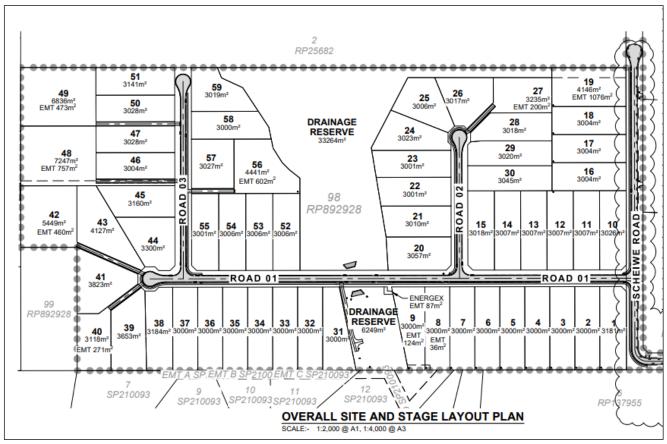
Approved lot layout for subdivision of land off Schiewe Road
